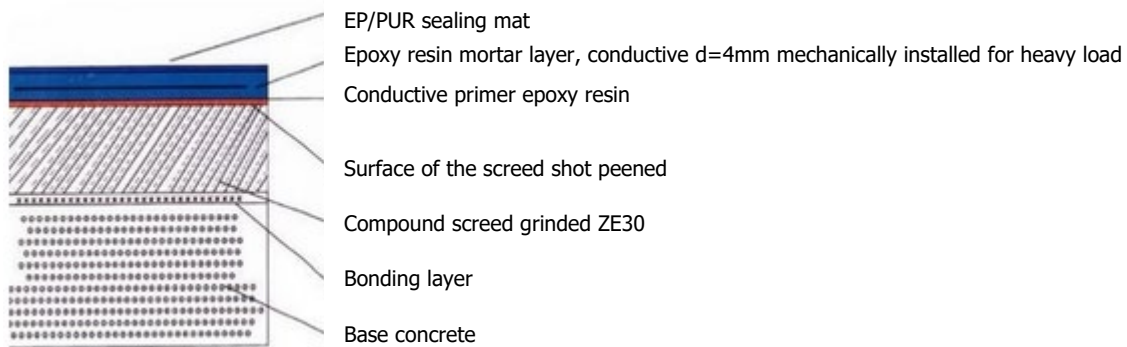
Conductive epoxy resin cast floor (Source: Leonhard Weiss Fußbodentechnik GmbH & Co. KG, D-73037 Göppingen www.lw-fussbodentechnik.de)
